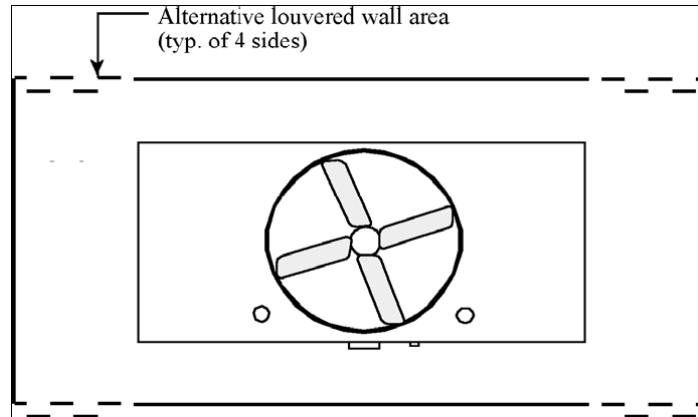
Plan view of dual air inlet unit in enclosure with alternate louver arrangement
